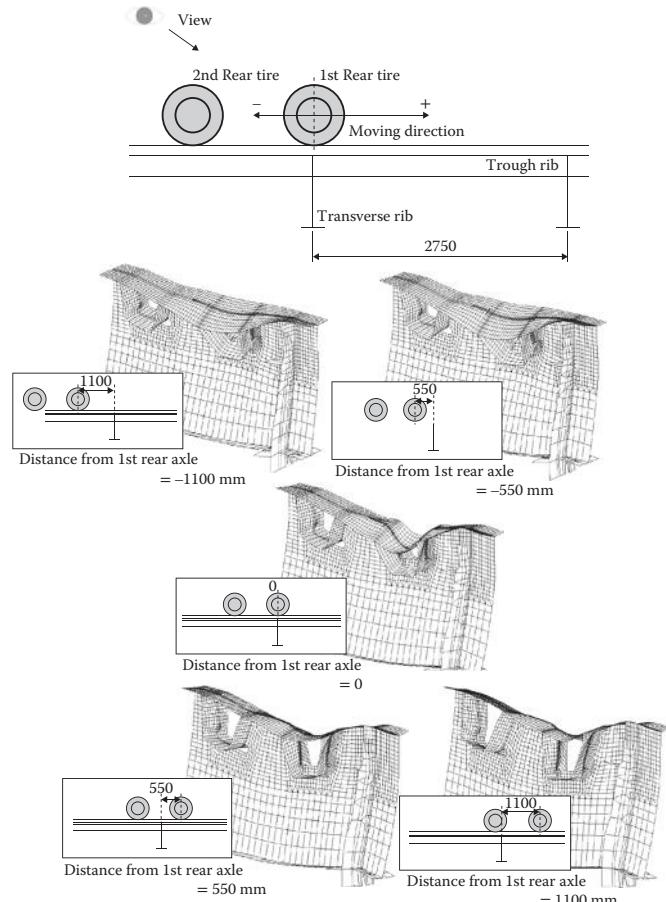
Deformations of orthotropic steel bridge decks in the connection area.
